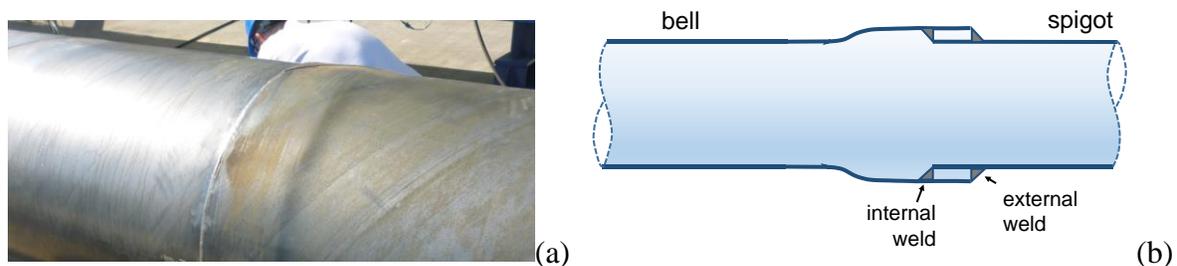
Configuration of lap-welded steel pipe joint.
